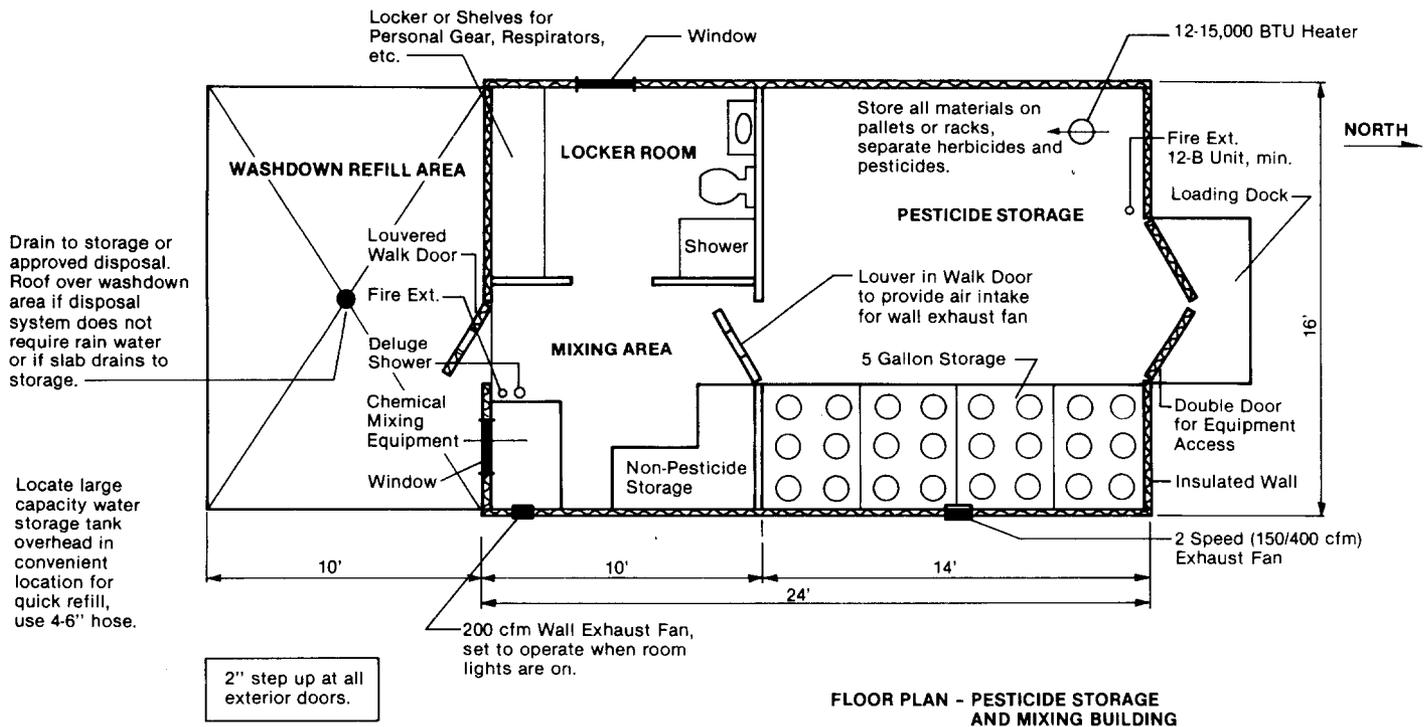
MW Plan #74002, "Pesticide Storage and Mixing Building," has been developed by the Midwest Plan Service. This plan is available from your County Extension Office.
